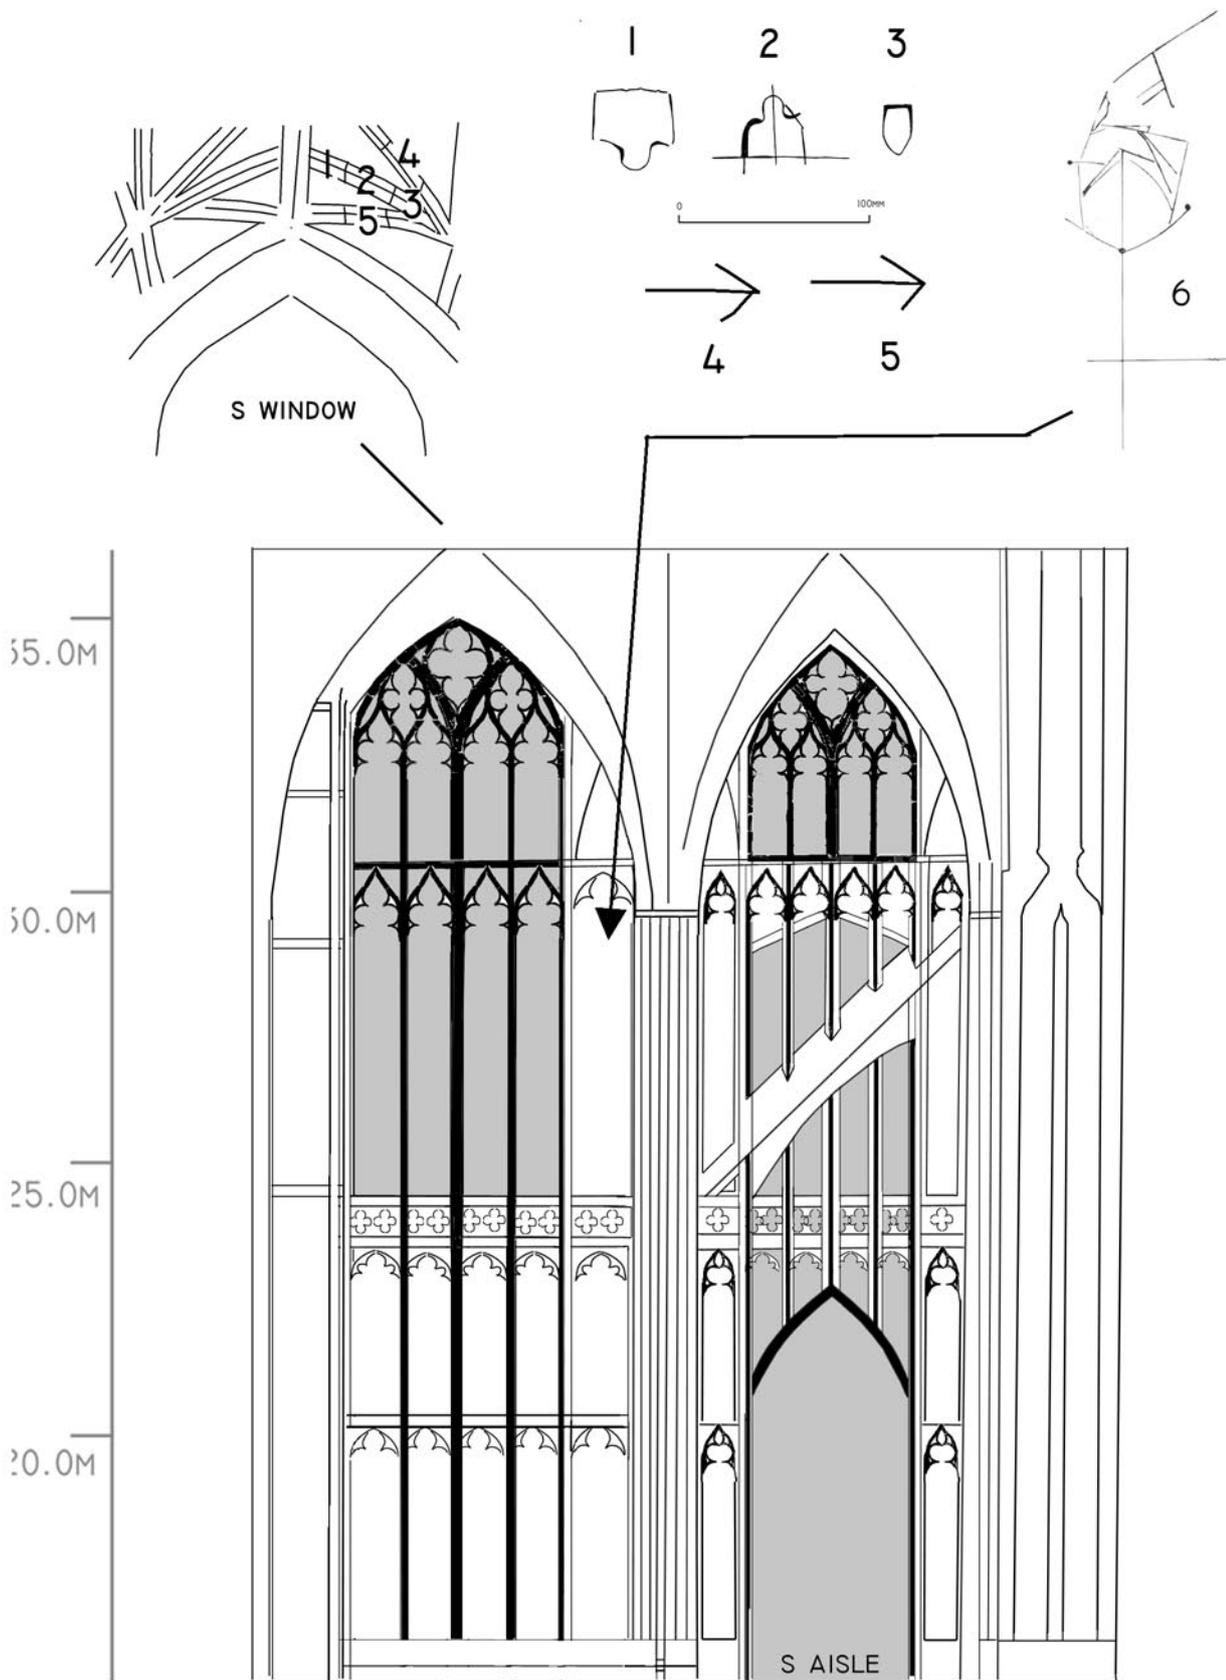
GLOUCESTER CATHEDRAL SOUTH TRANSEPT ~ WEST ELEVATION, INTERIOR
